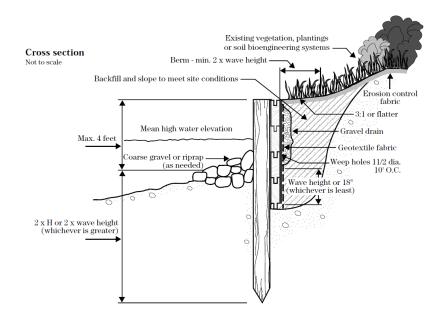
Cross section of a system of piles supporting horizontal tongue-in-groove planks separating the embankment from mean high water with gravel or rip rap on the water side. USDA NRCS 1996.
